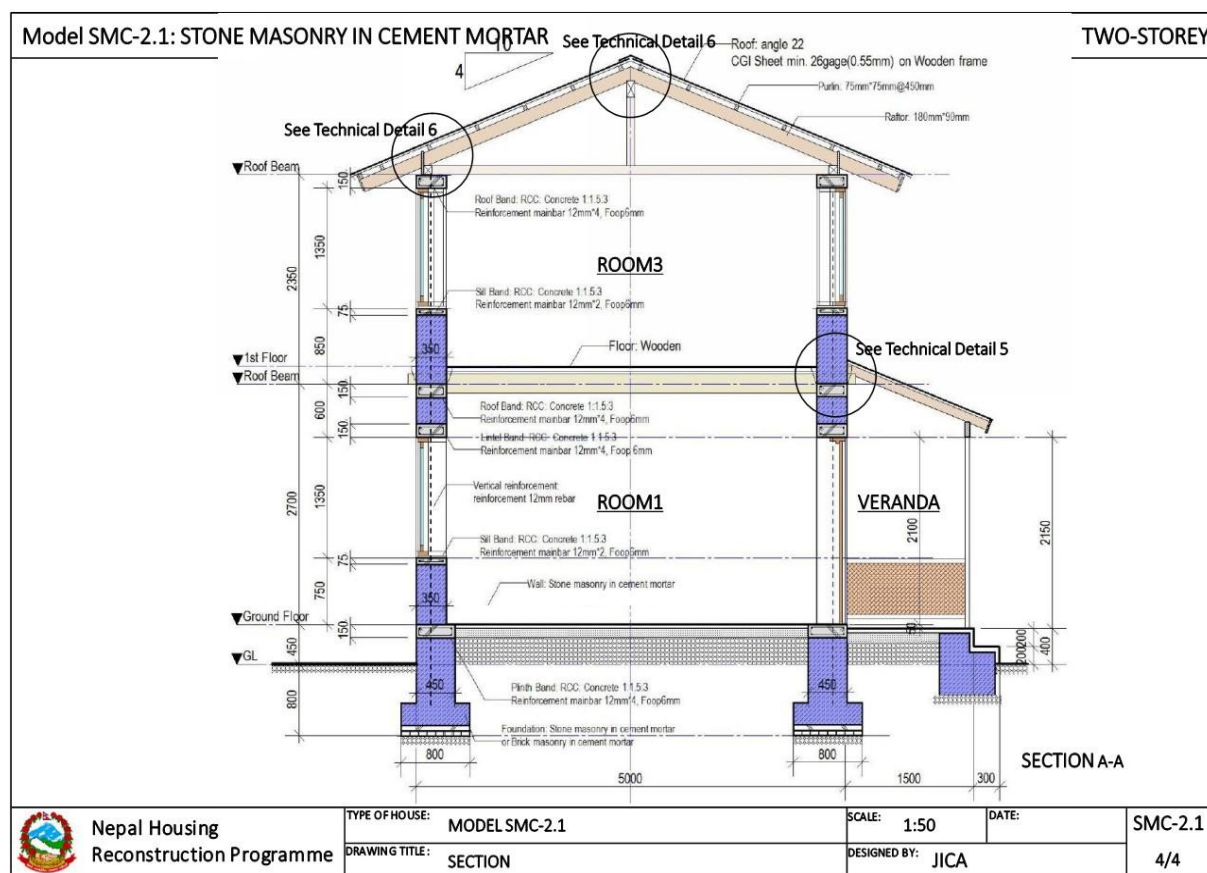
Model SMC-2.1: Stone Masonry in Cement Mortar – Typical Section
